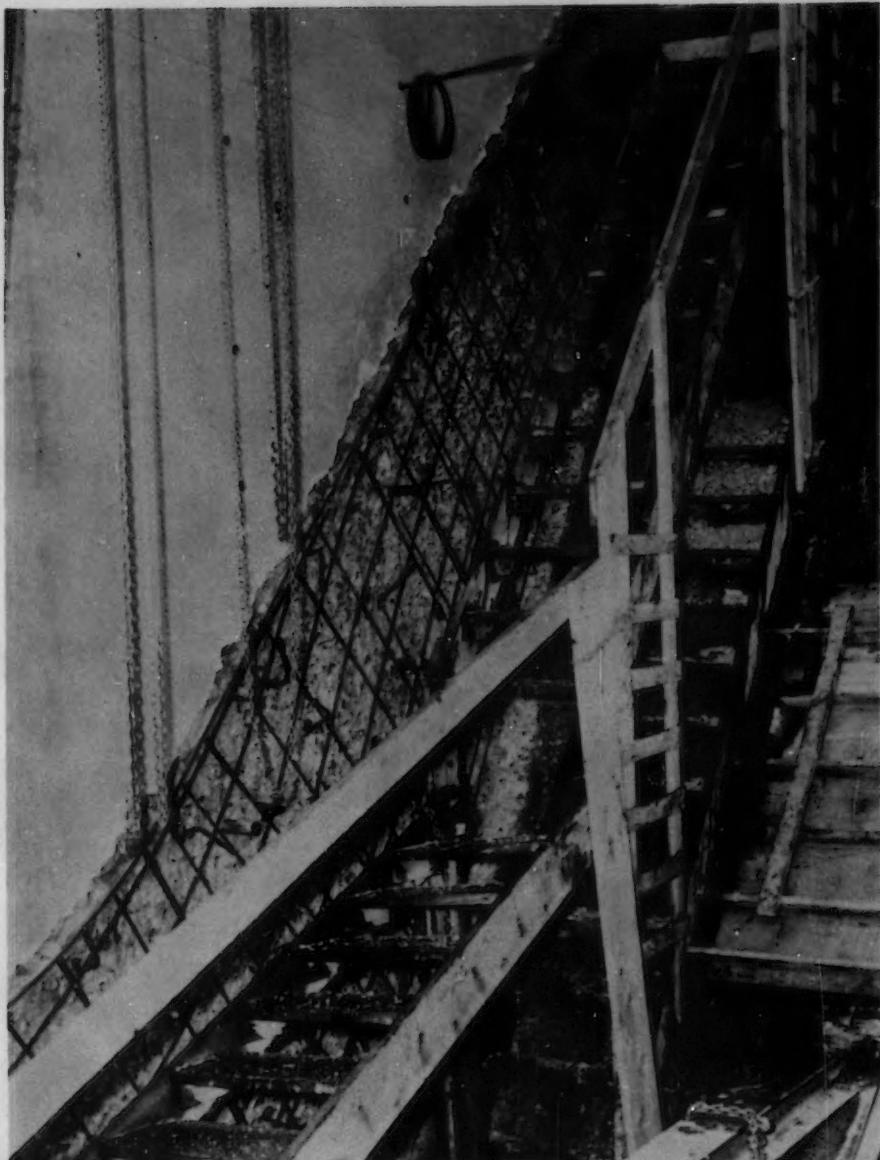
SHOWING REINFORCING IN PLACE ON SIDE OF PIER NO. 7
